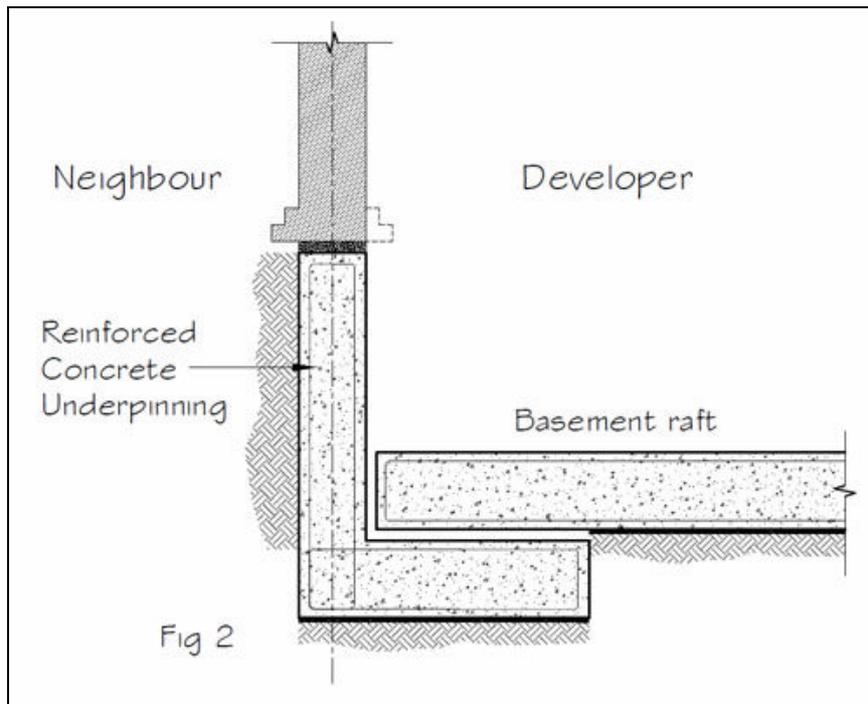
1990's: To save space, the mass concrete is replaced by reinforced concrete ('Special Foundation') but it is separate from the Building Owner's basement raft and other foundations.
